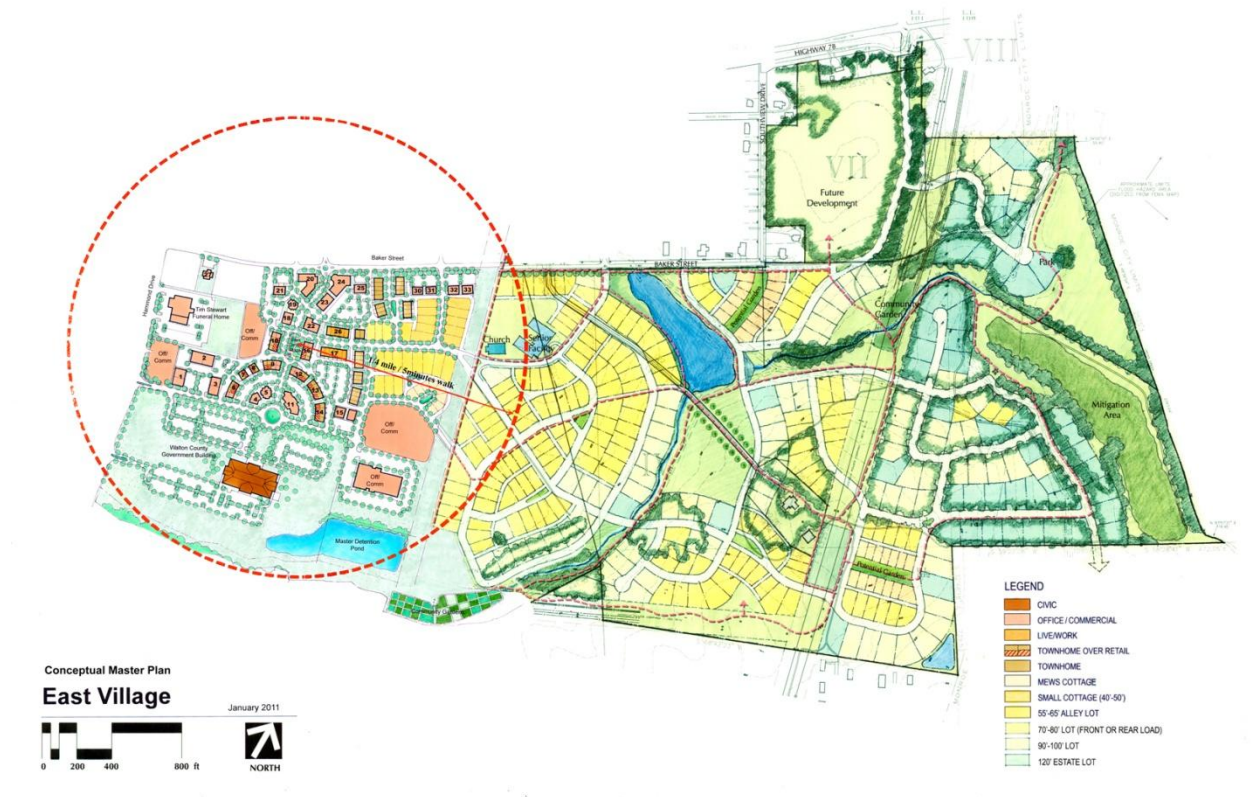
East Village Monroe Site Plan (2-22-2011)
